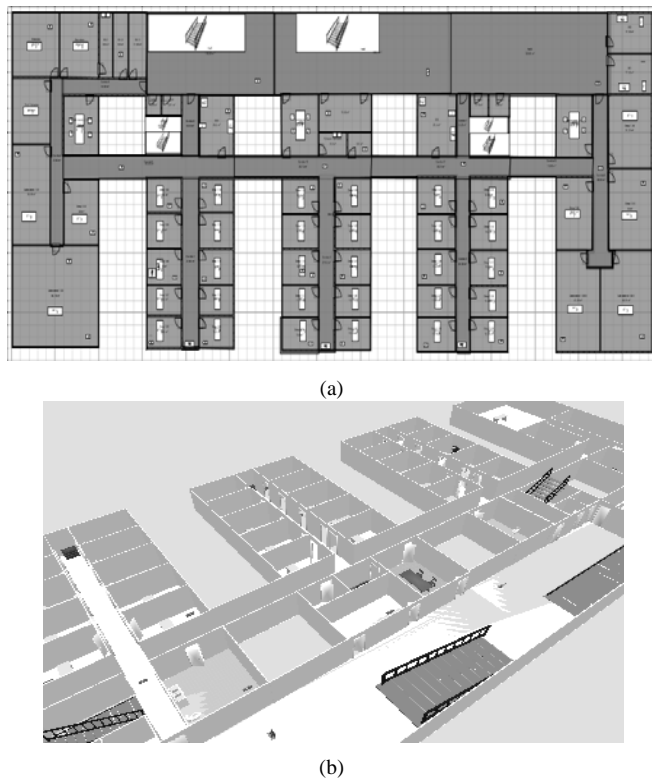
(a) Floor 2D Building. (b) Floor 3D Building.
